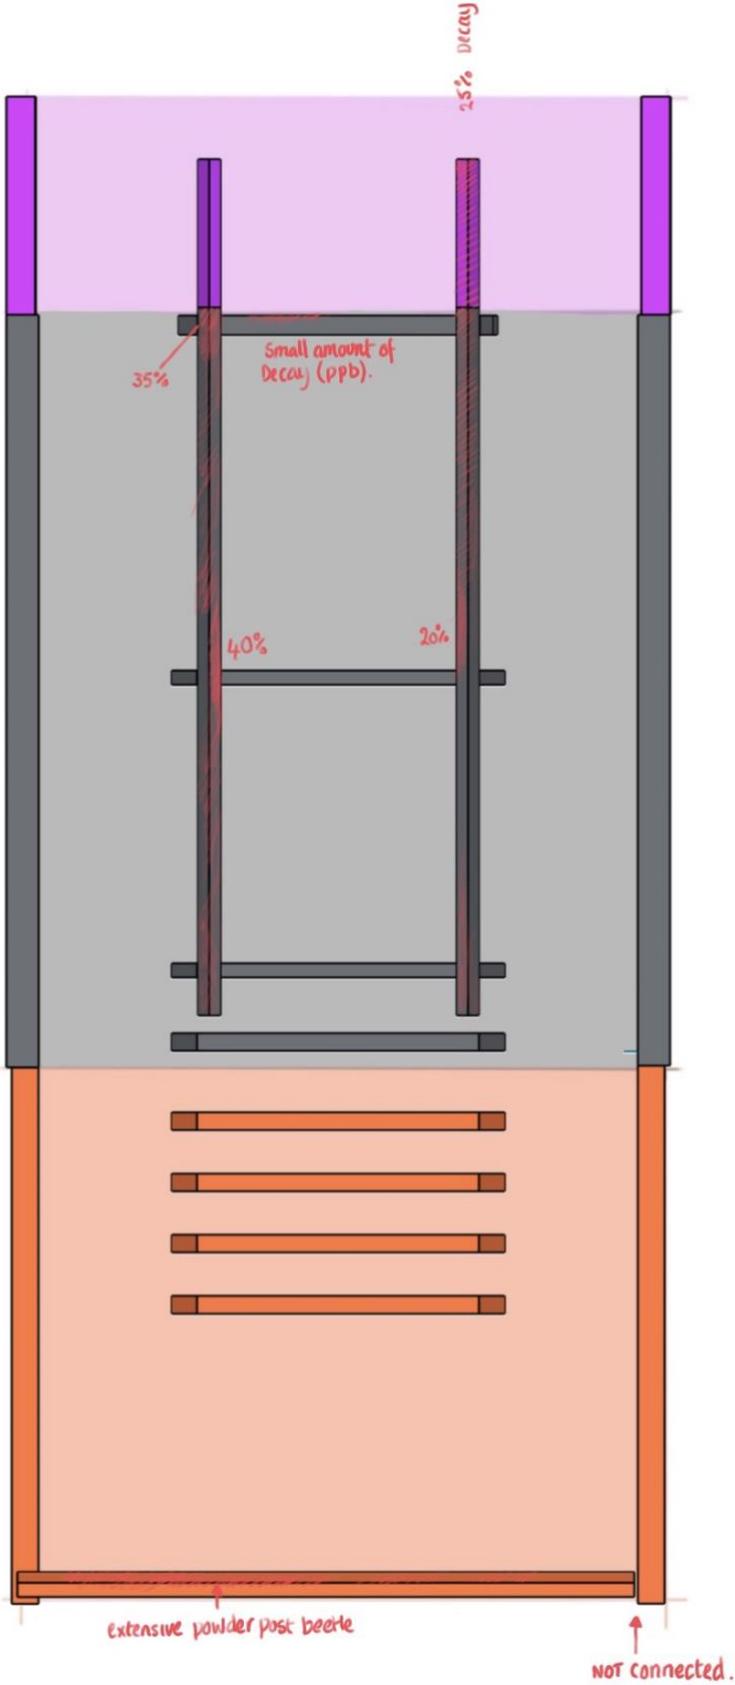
, Plan of Purlins, Collars and Wall-Plates.
